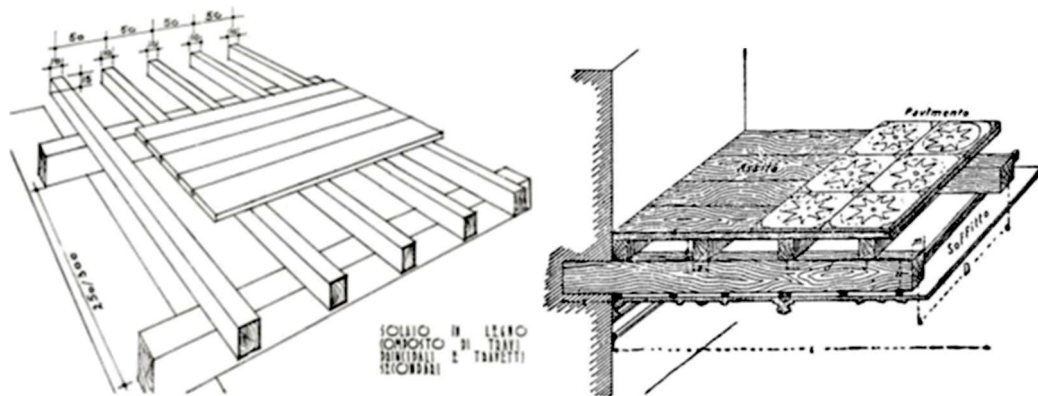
Main beams/secondary joist historical timber floors (left photo from [15], right photo from [14])
